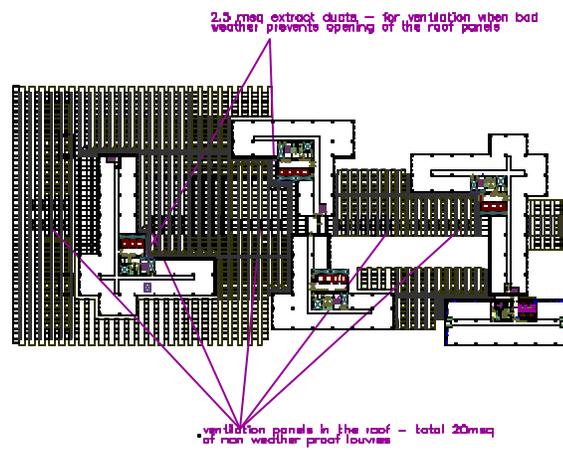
WTC Roof Plan (KPFI, 1999)
